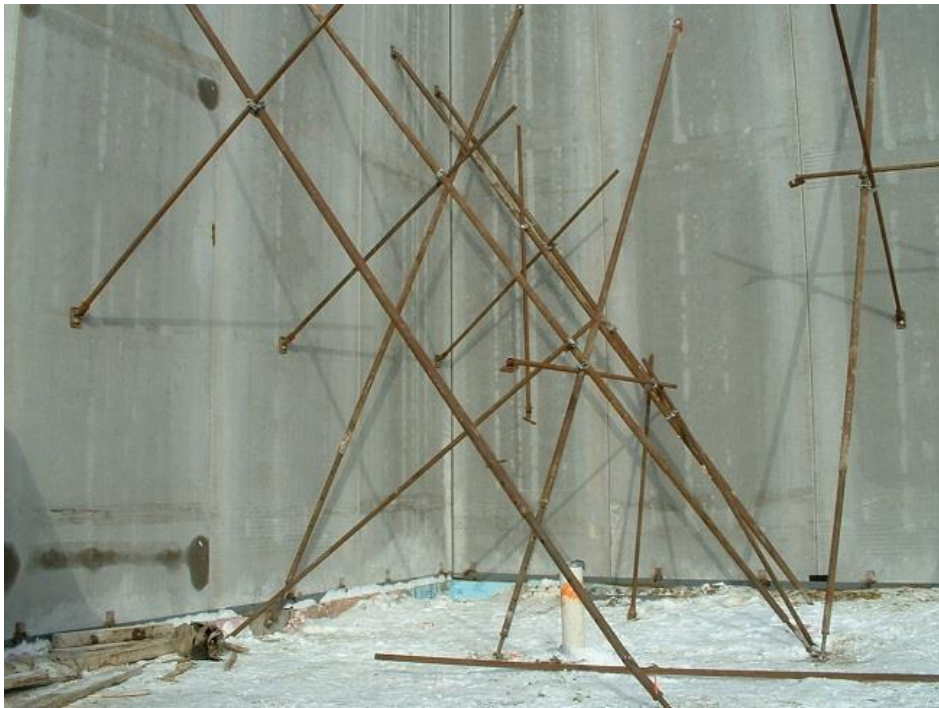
and 2 show the temporary diagonal bracing that holds precast concrete wall panels plumb until permanent bracing, floors, and roofs are installed.
